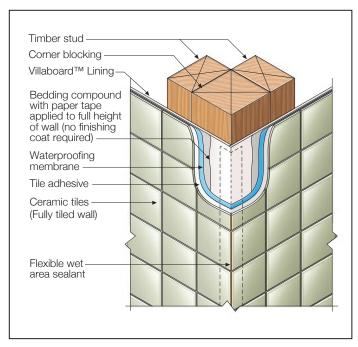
EXTERNAL FULL TILED CORNER - BLOCKED CORNER FULLY TILED WALLS
